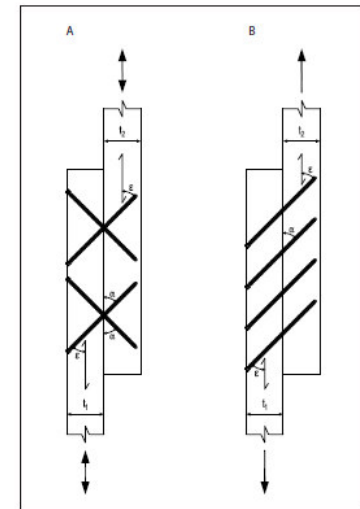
Inclined screwed connections (A) cross screw connection (B) tension screw connection
